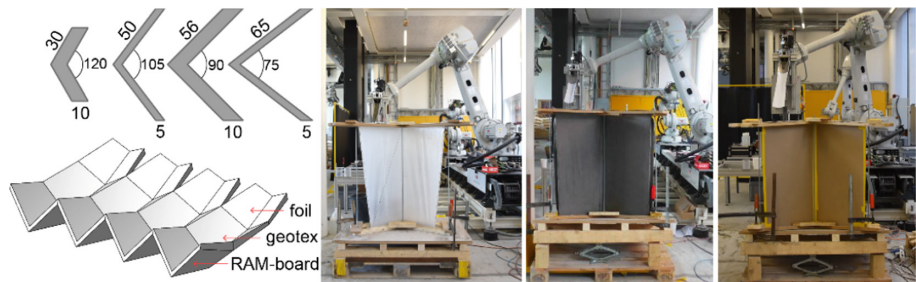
The design of the folded roof section with varying cross-section [cm] consisting of three elements cast in weakly supported formwork with the robotic setup.
